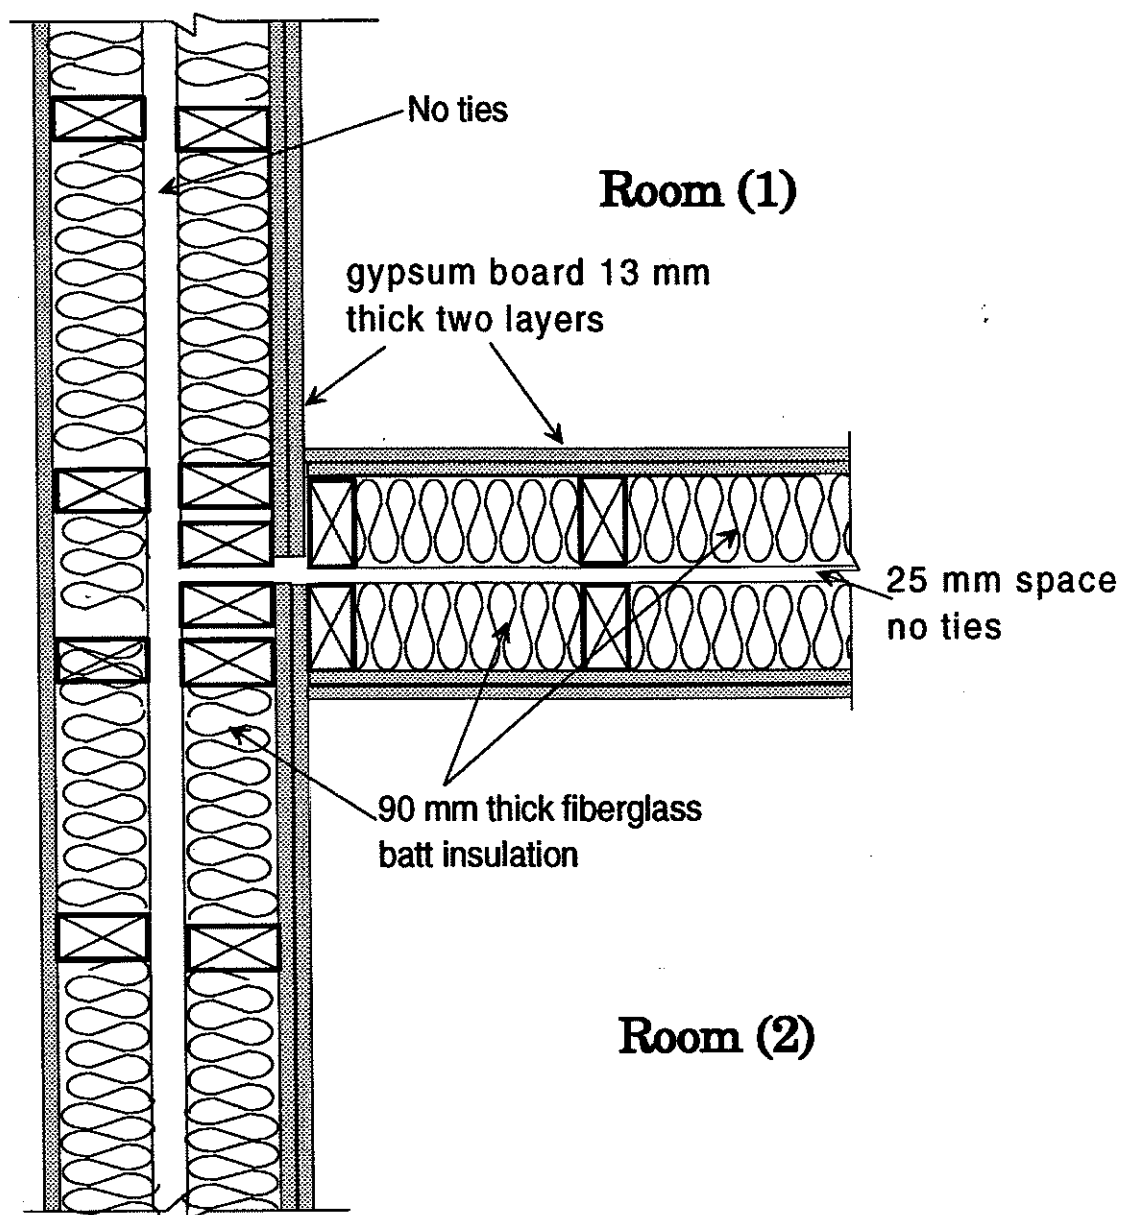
Plan section through the party and flanking walls of the upper rooms.
